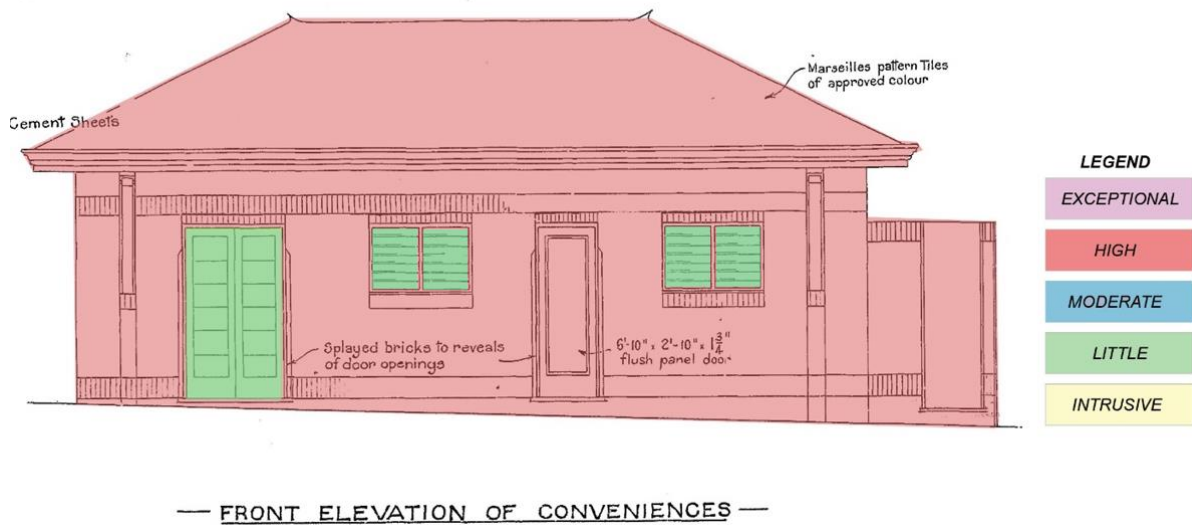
Element gradings of the north-western (side) elevation of the Denistone Station Conveniences Building (Source: RailCorp in Arcilla, Gupta and Binkhorst 2019. p. 17, additional assessment by Artefact 2021)
